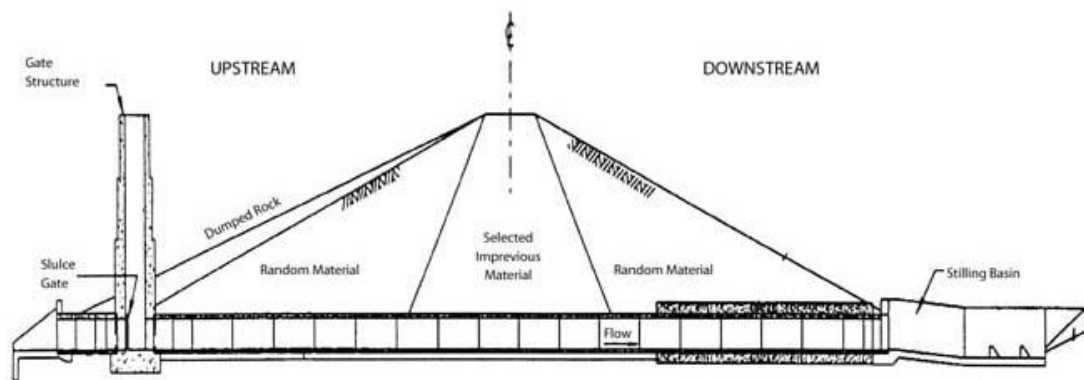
Typical cross section of a simple composite embankment dam (source: ICOLD website)
